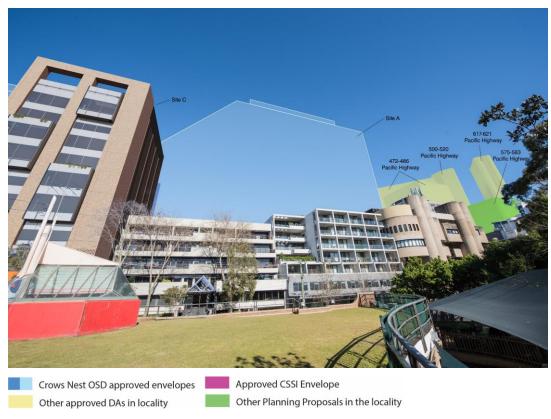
the detailed design of Site C and the approved building envelopes for Sites A and B as viewed from Hume Street Park, Crows Nest
